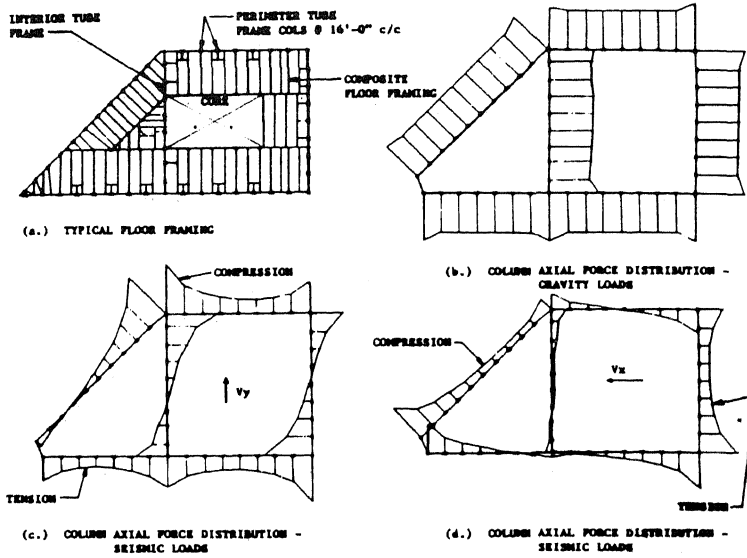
MAGUIRE PARTNERS/CROCKER CENTER, SOUTH TOWER.
